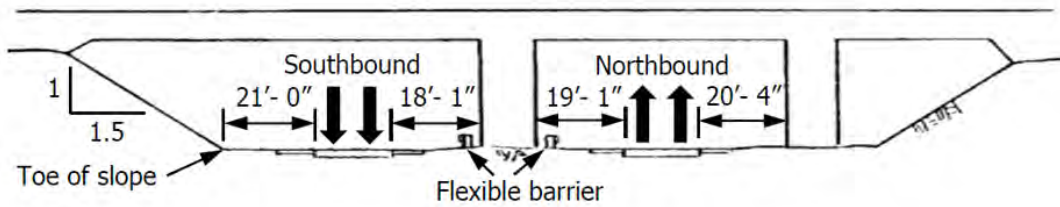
Bridge elevation view with two highway features below the bridge for a highway that is divided at the bridge (Example 3)
